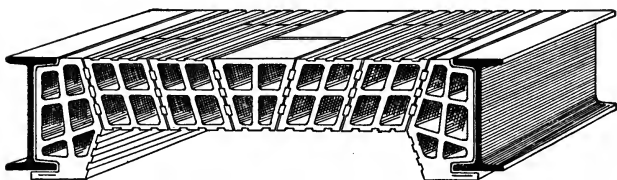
Side-construction Terra-cotta Arch. Raised Skew-backs.
